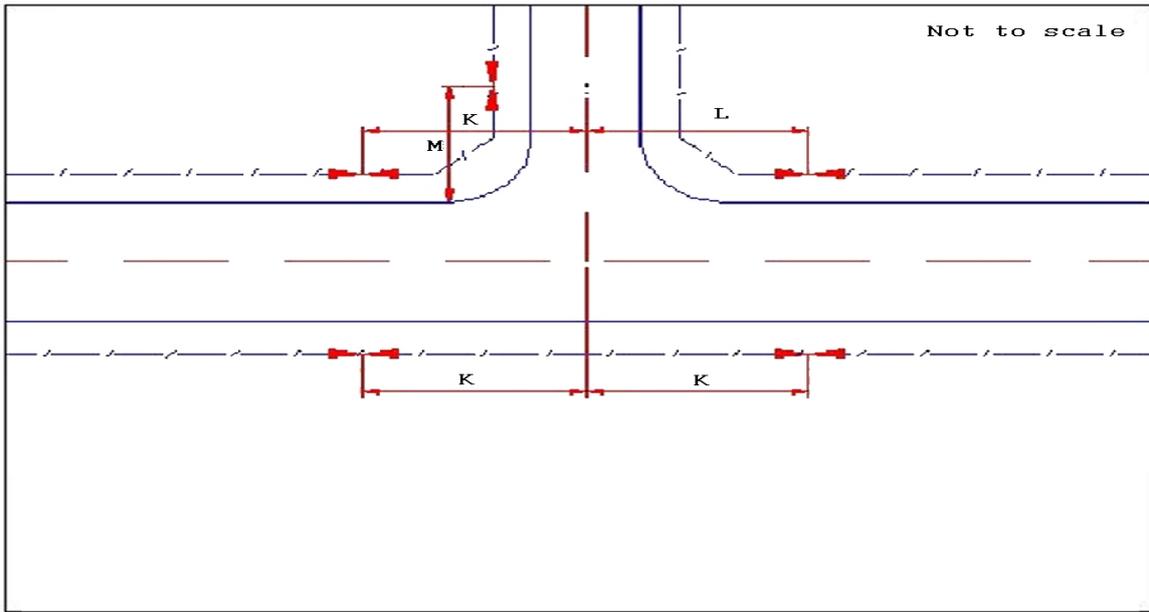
Minimum spacing between property accesses relative to intersections
